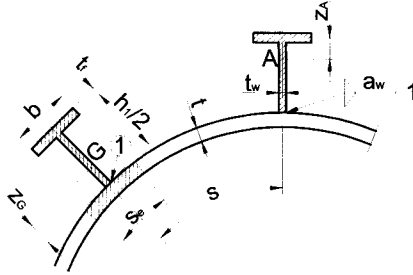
Halved rolled I-section stringers welded outside to the shell
